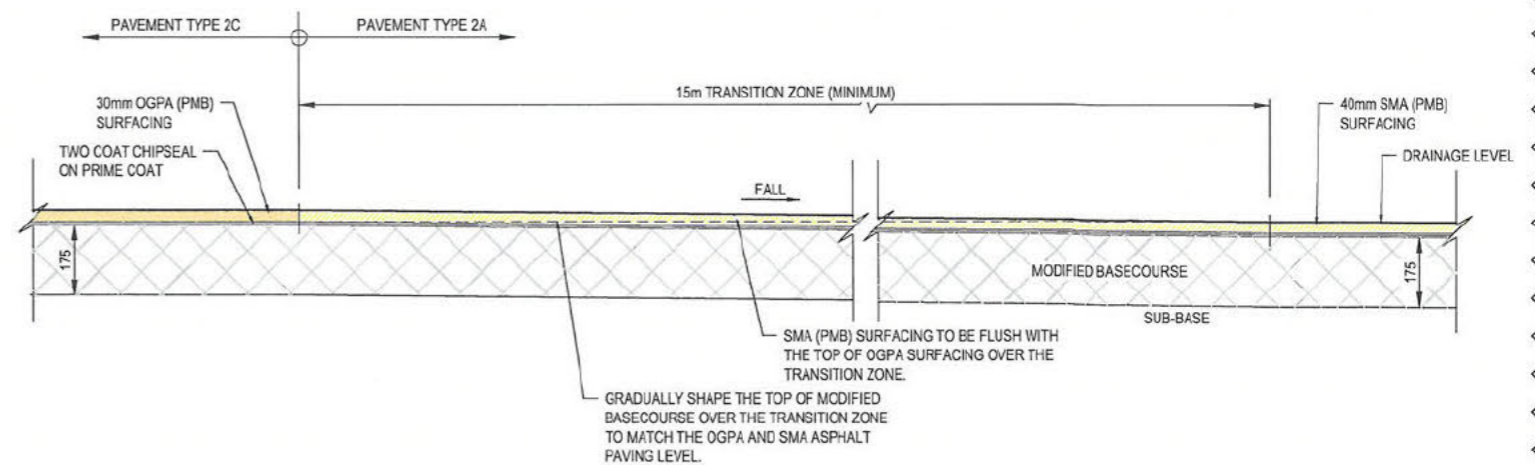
DETAIL - OGPA/CHIPSEAL TRANSITION - OGPA FALLING TO CHIPSEAL
